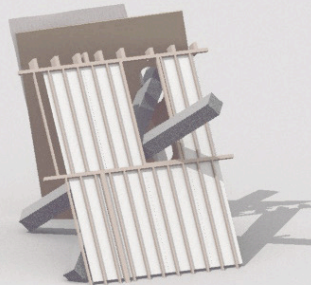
Assembly of one asphalt road part, one exterior stucco part, and one interior plaster part.
